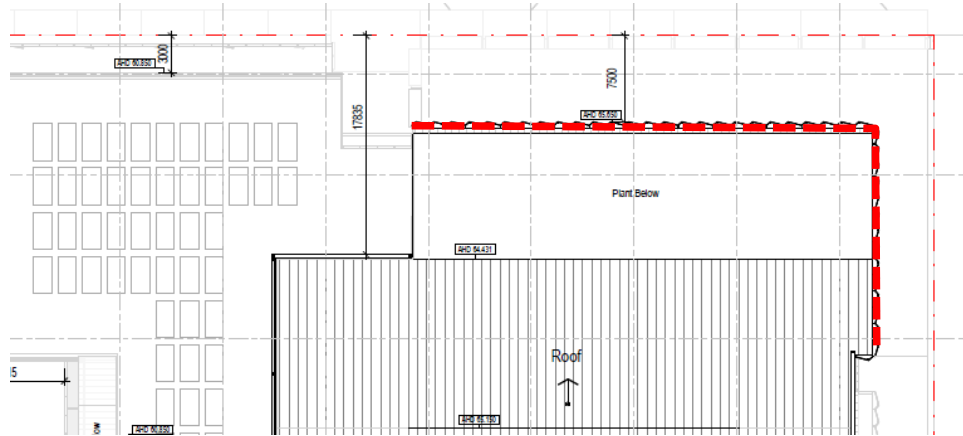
Extract from the roof plan with red line indicating parapet around plant
